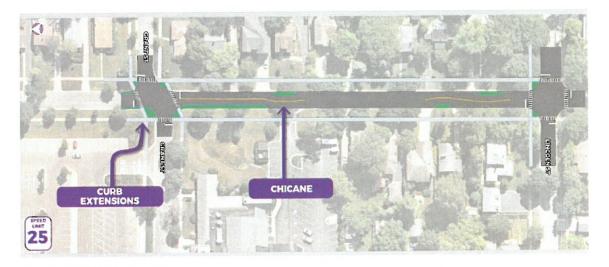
MAIN STREET FROM PRAIRIE STREET TO DOWNTOWN RECOMMENDATIONS
